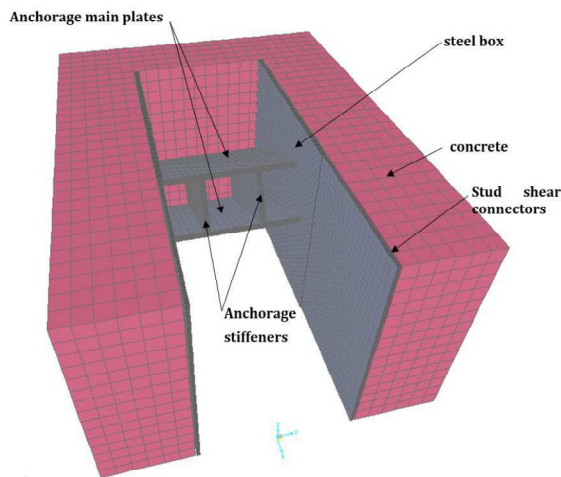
3D local FEM of composite steel-concrete box section and stay anchor
